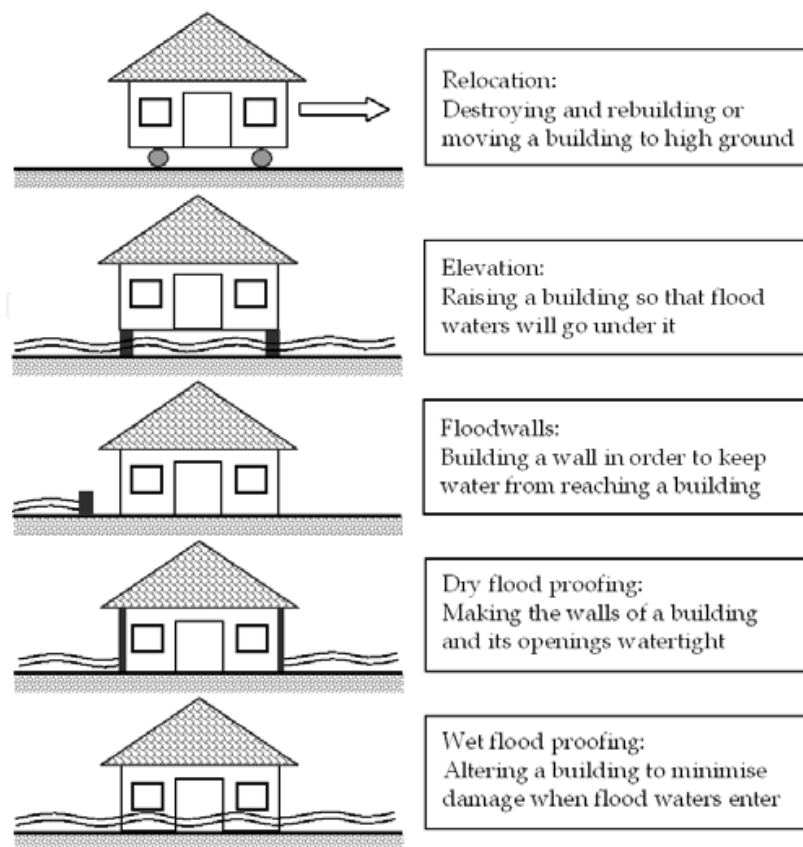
Examples of flood proofing measures (adapted from UNESCO, 1995)
